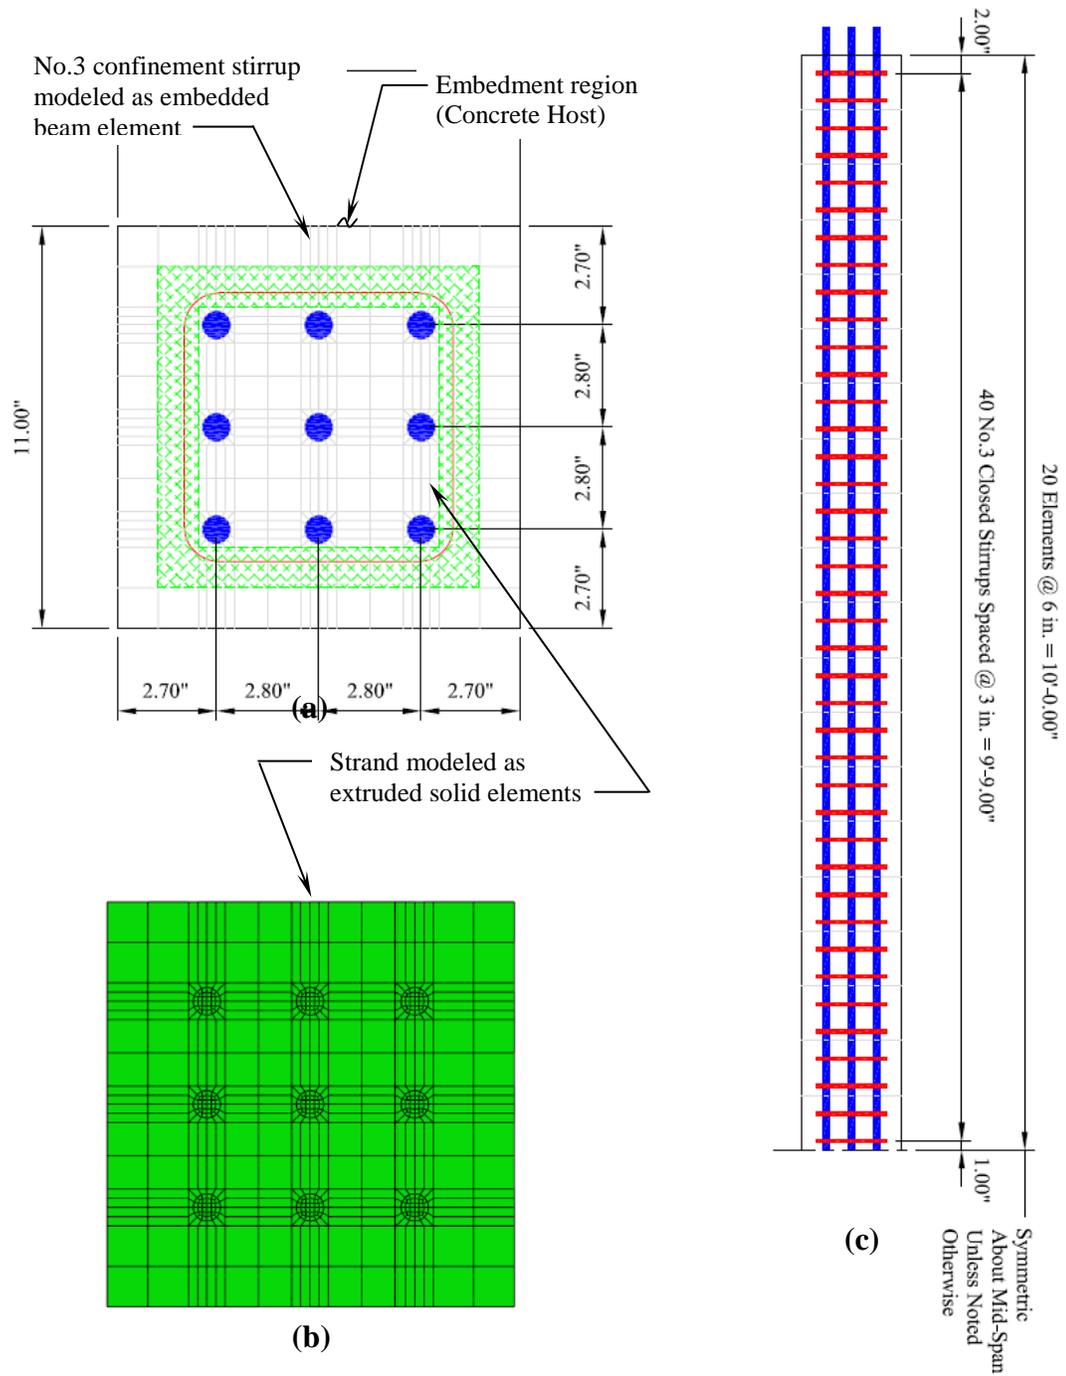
Details of Class I [S280-U070-C3; S280-U140-C3] finite element models: (a) Typical cross section, (b) Finite element simulation, and (c) Layout of confinement reinforcement (No.3 closed stirrups spaced at 3 in. on center)
